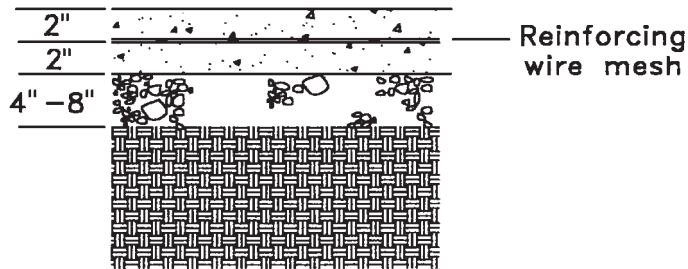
Detail of typical concrete pavement for sidewalk, light duty.
